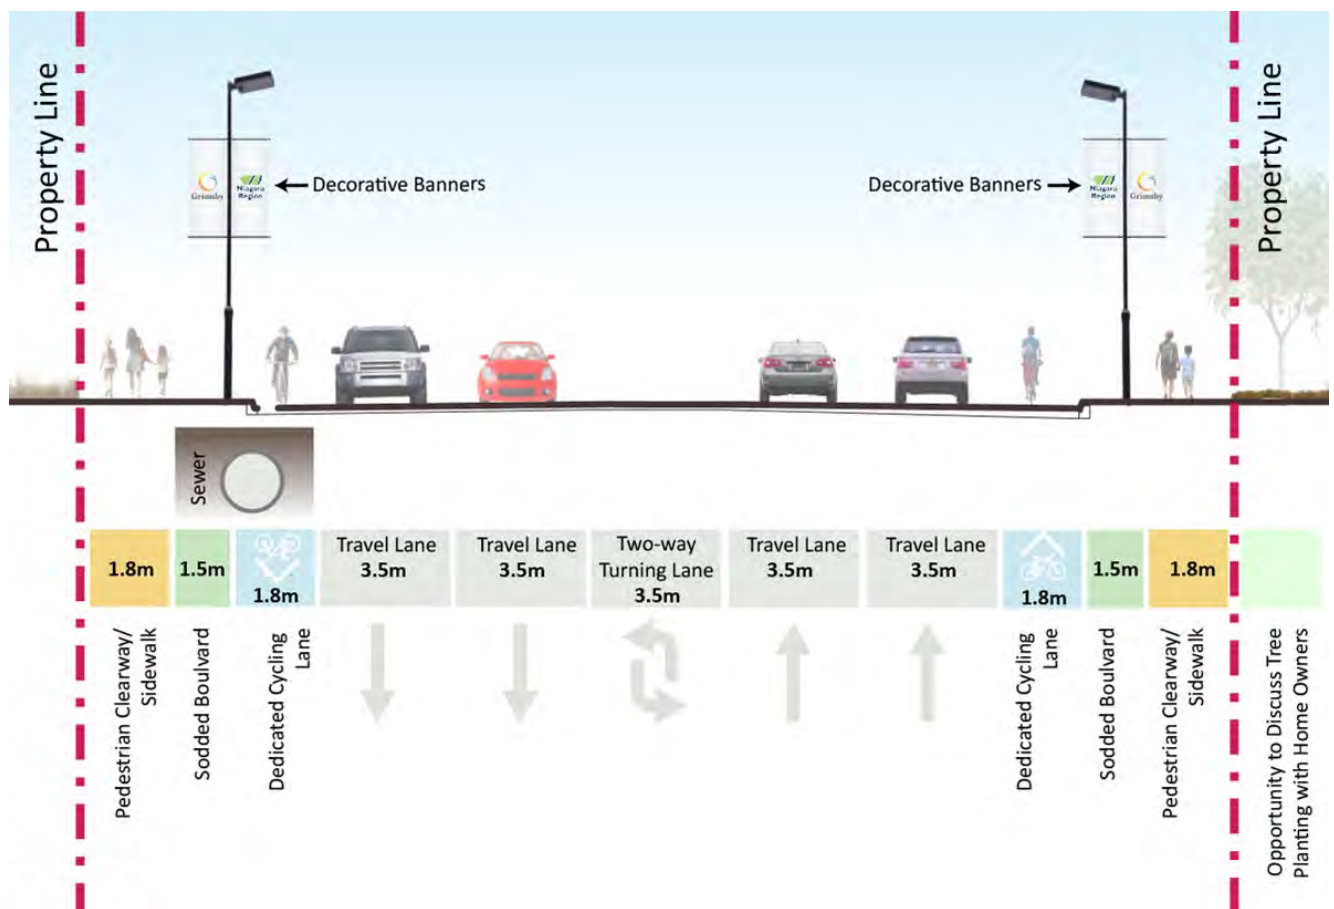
Typical Casablanca Boulevard Cross Section (north of Livingston Avenue)
